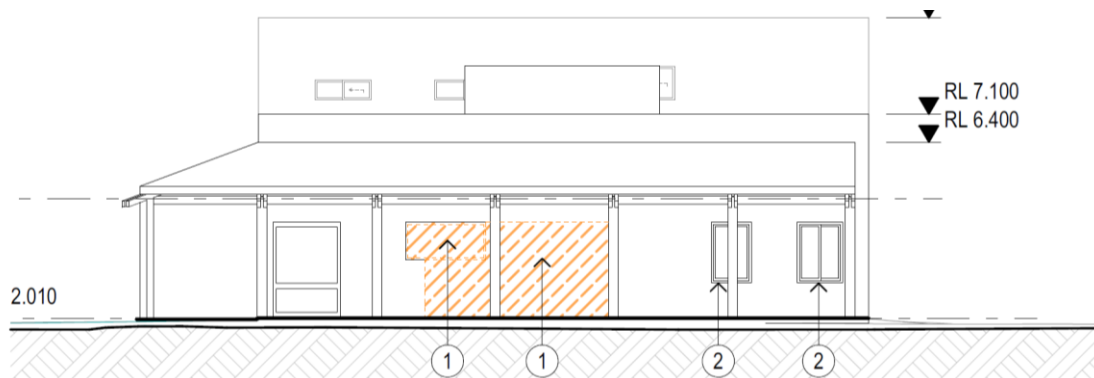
Proposed Demolition (East Elevation - To Esplanade)
